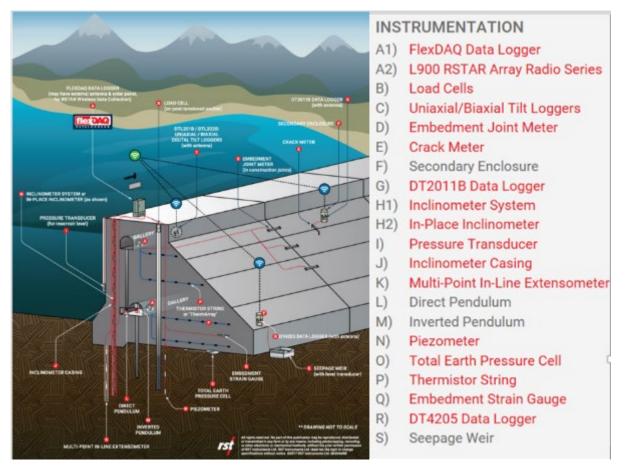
A typical overview of the in-situ dam monitoring systems for a concrete gravity dam ^[18].
